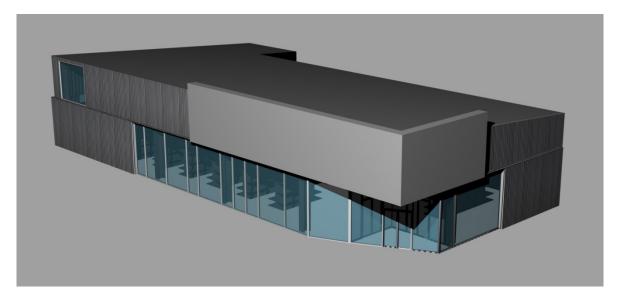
Case Study #3 – Typical Pre-Engineered Steel Single-Storey Retail Building
